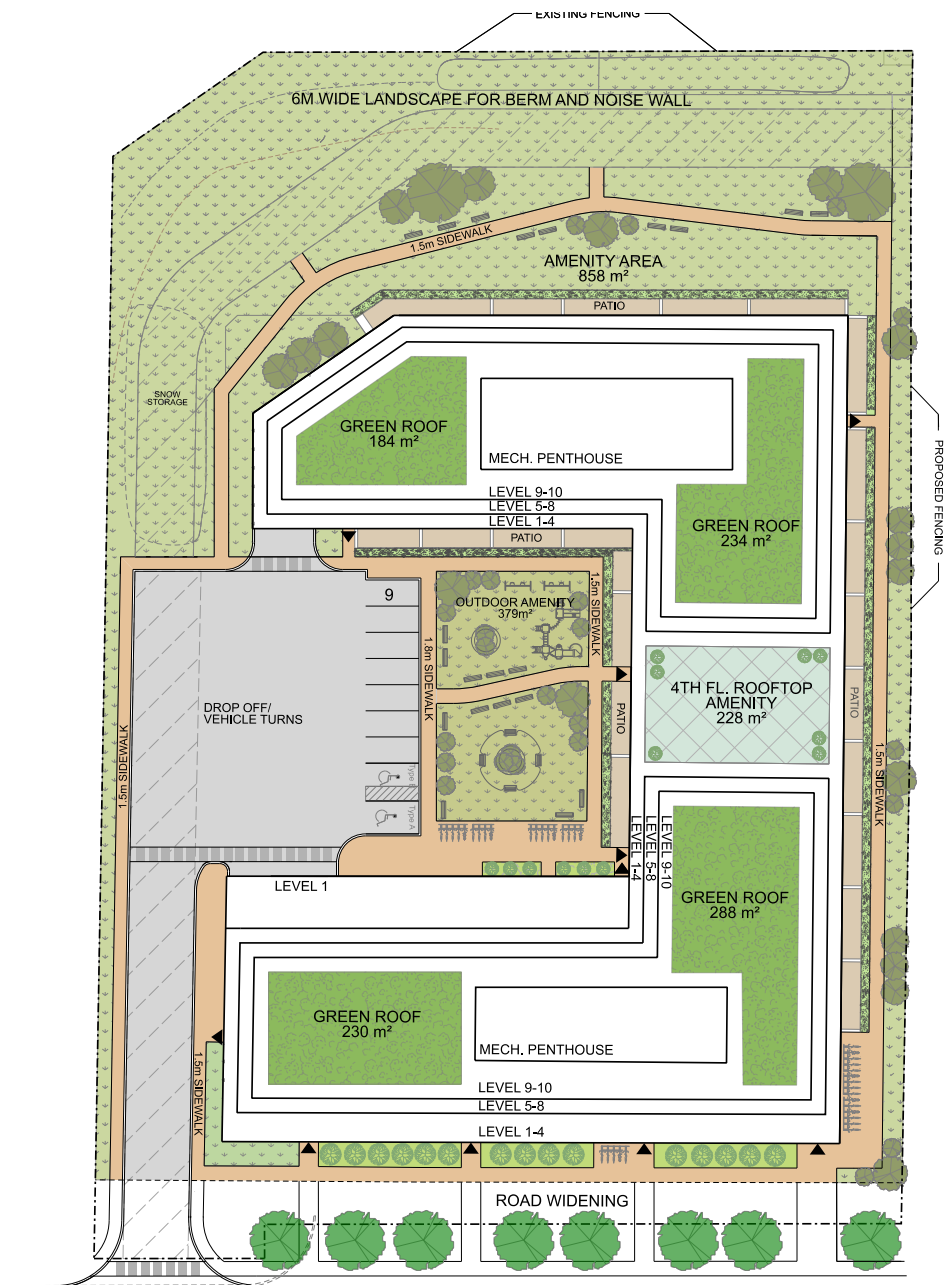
Proposed Landscape Plan Prepared by Weston Consulting
